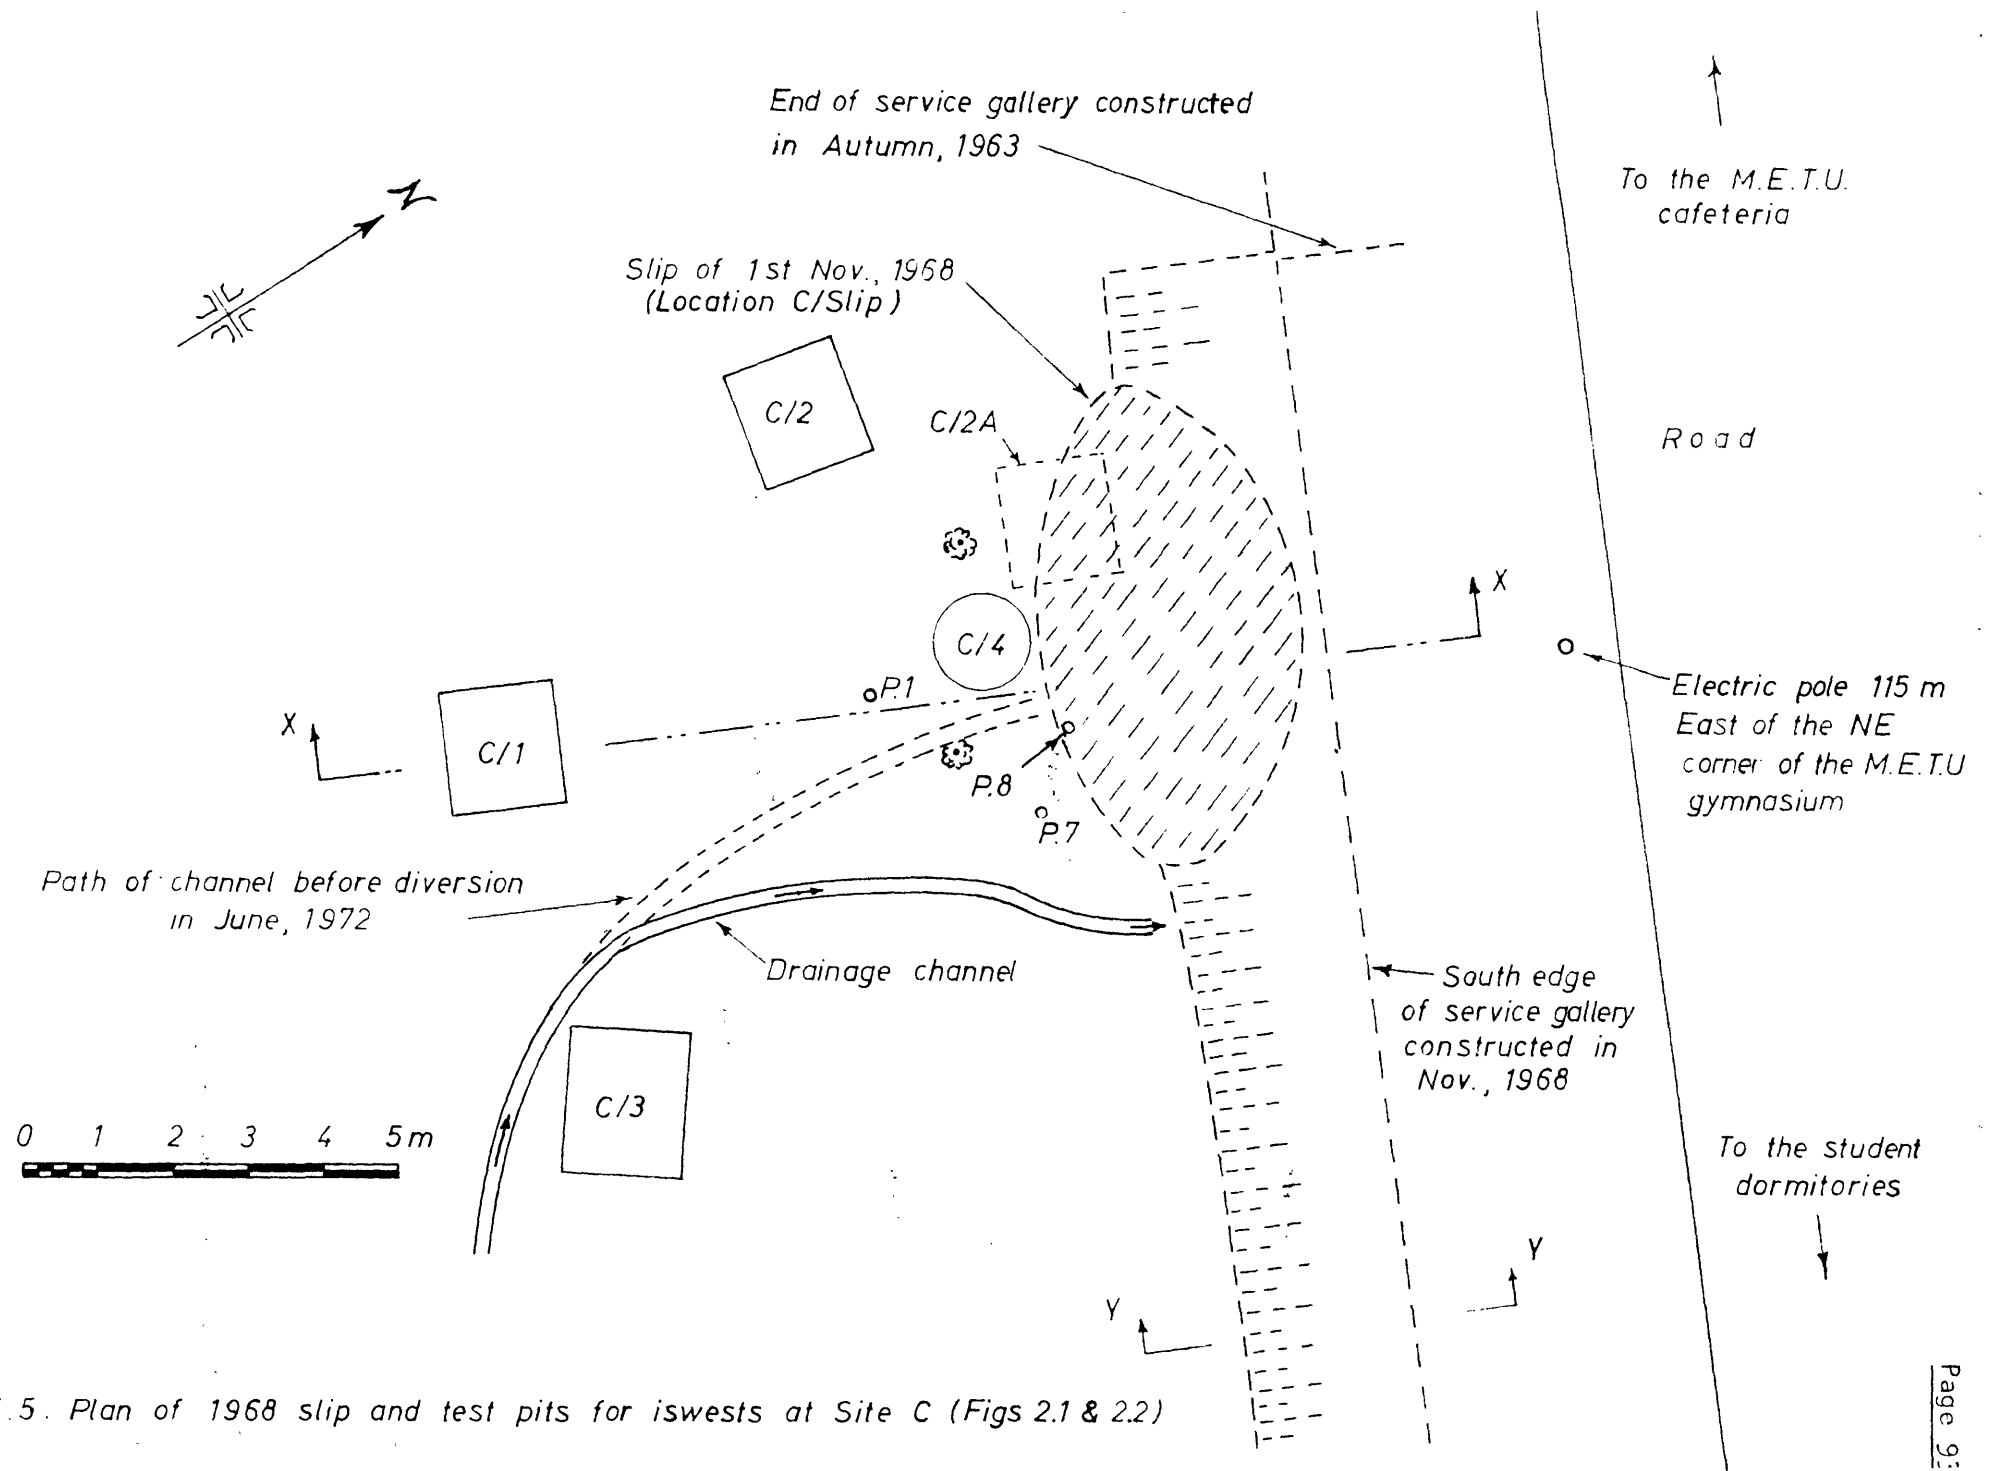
Plan of 1968 slip and test pits for iswests at Site C (Figs 2.1 & 2.2)
